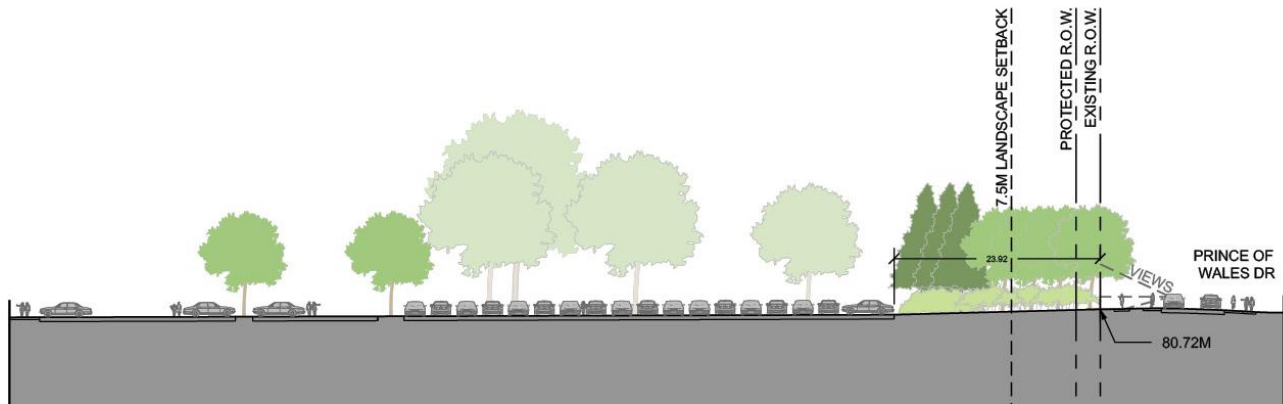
Section 2 Looking North at Prince of Wales Drive and Parking Lot
